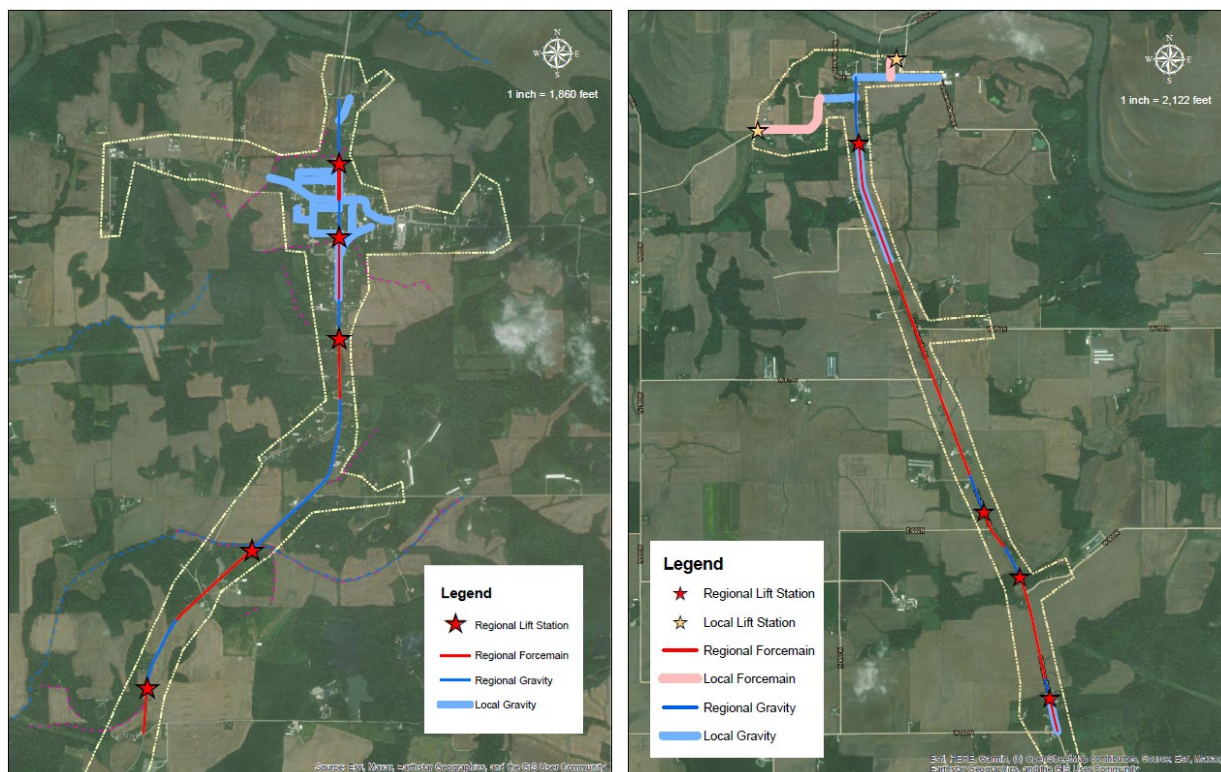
Option 1D - Haysville and Portersville Sewer System
